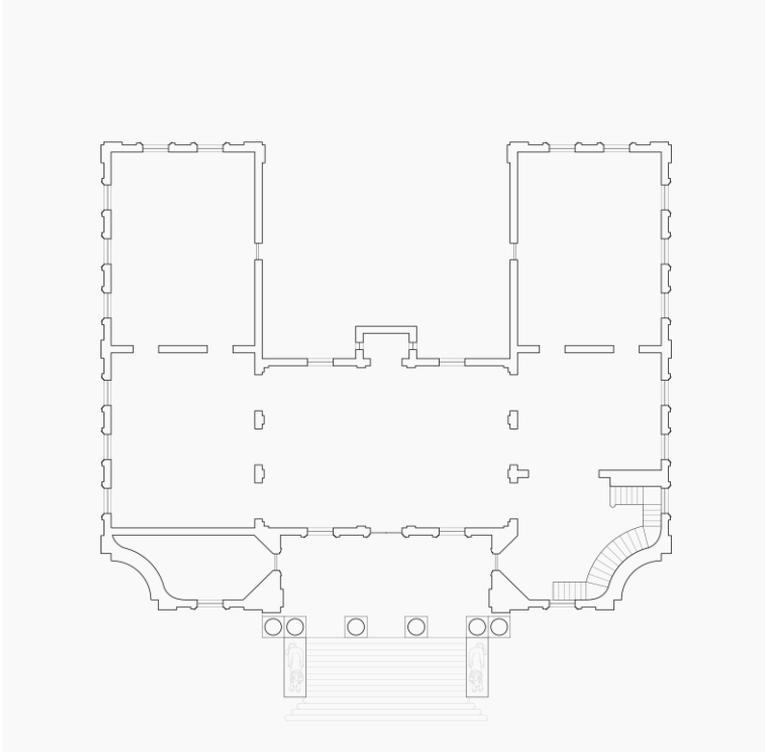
Original floor plan, stairs still present. The U-shaped plan is cut off from its central courtyard. Author, 2021.
